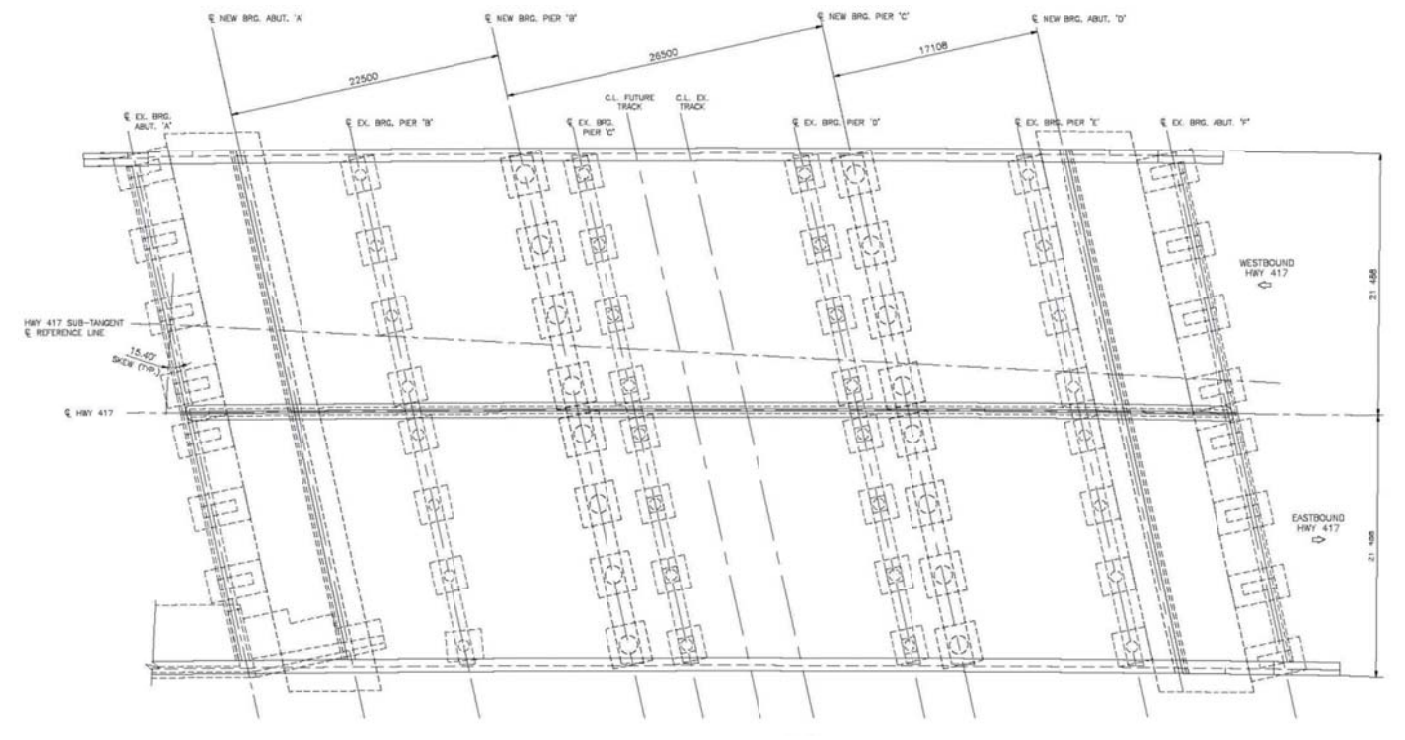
Alternative I – Three-Span Deck Structure Installed by Jack-And-Slide
